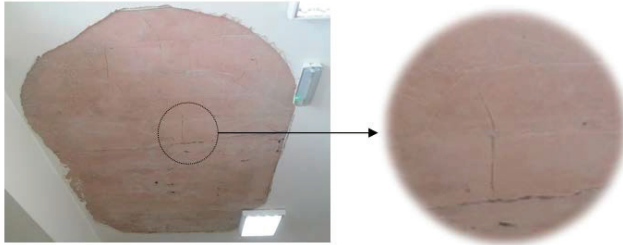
Example of the ceiling plaster falling off from the concrete substrate in a new building
